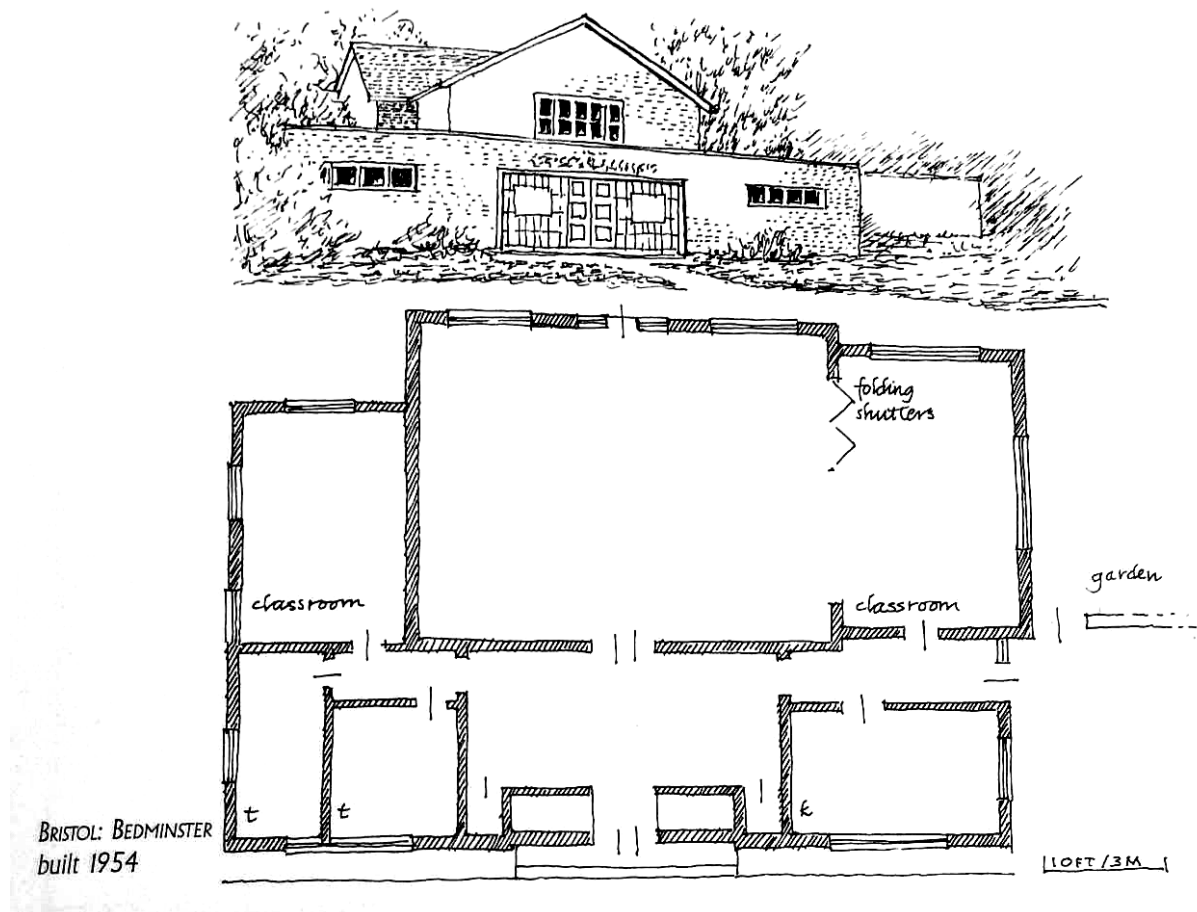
Plan and elevation, from Butler, vol. 2, 1999, p. 525
